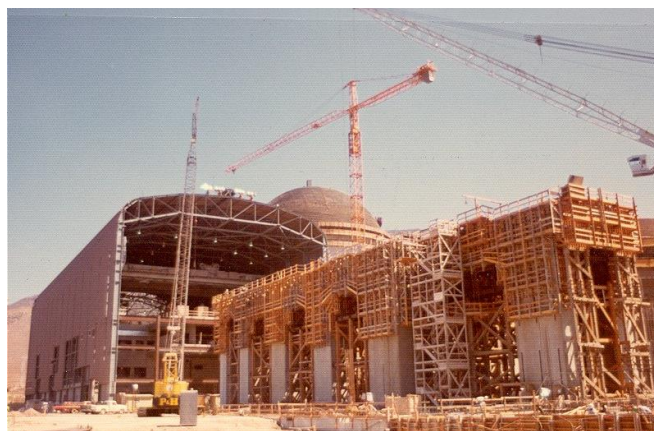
1972 photo of completed north half of Turbine Building for Unit 1 (left) and the south half for Unit 2 (right, foreground) under construction. Source: PG&E.
